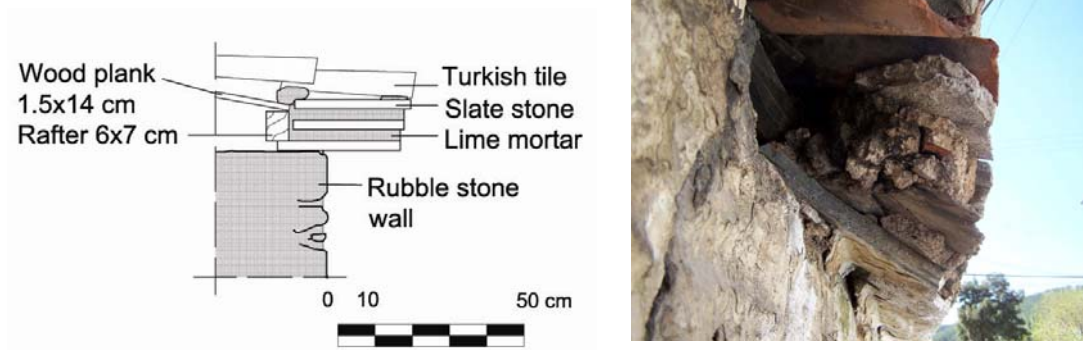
Detail of short eave - *gumile* (Cami St. No: 12)
